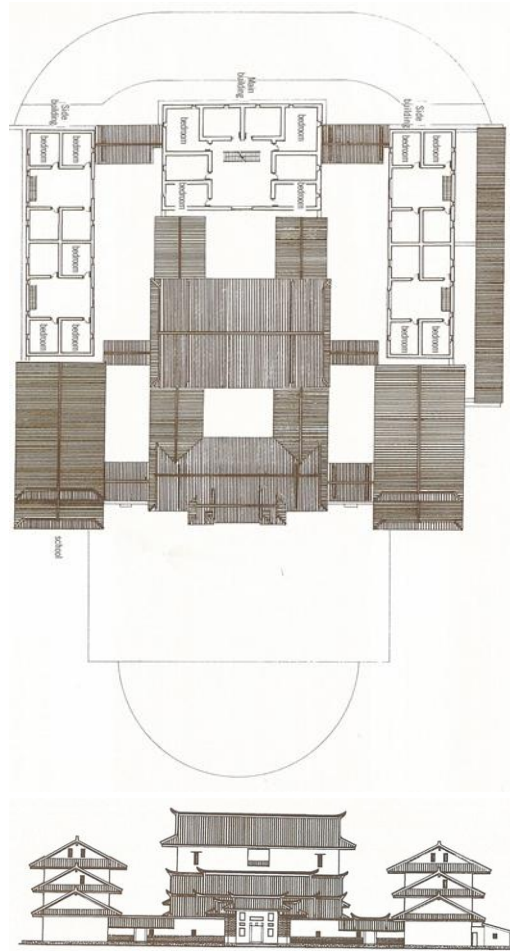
Diagram Indicating the Typical Plan (Source: Wang, Qijun. *Vernacular Dwellings*, p.148)
